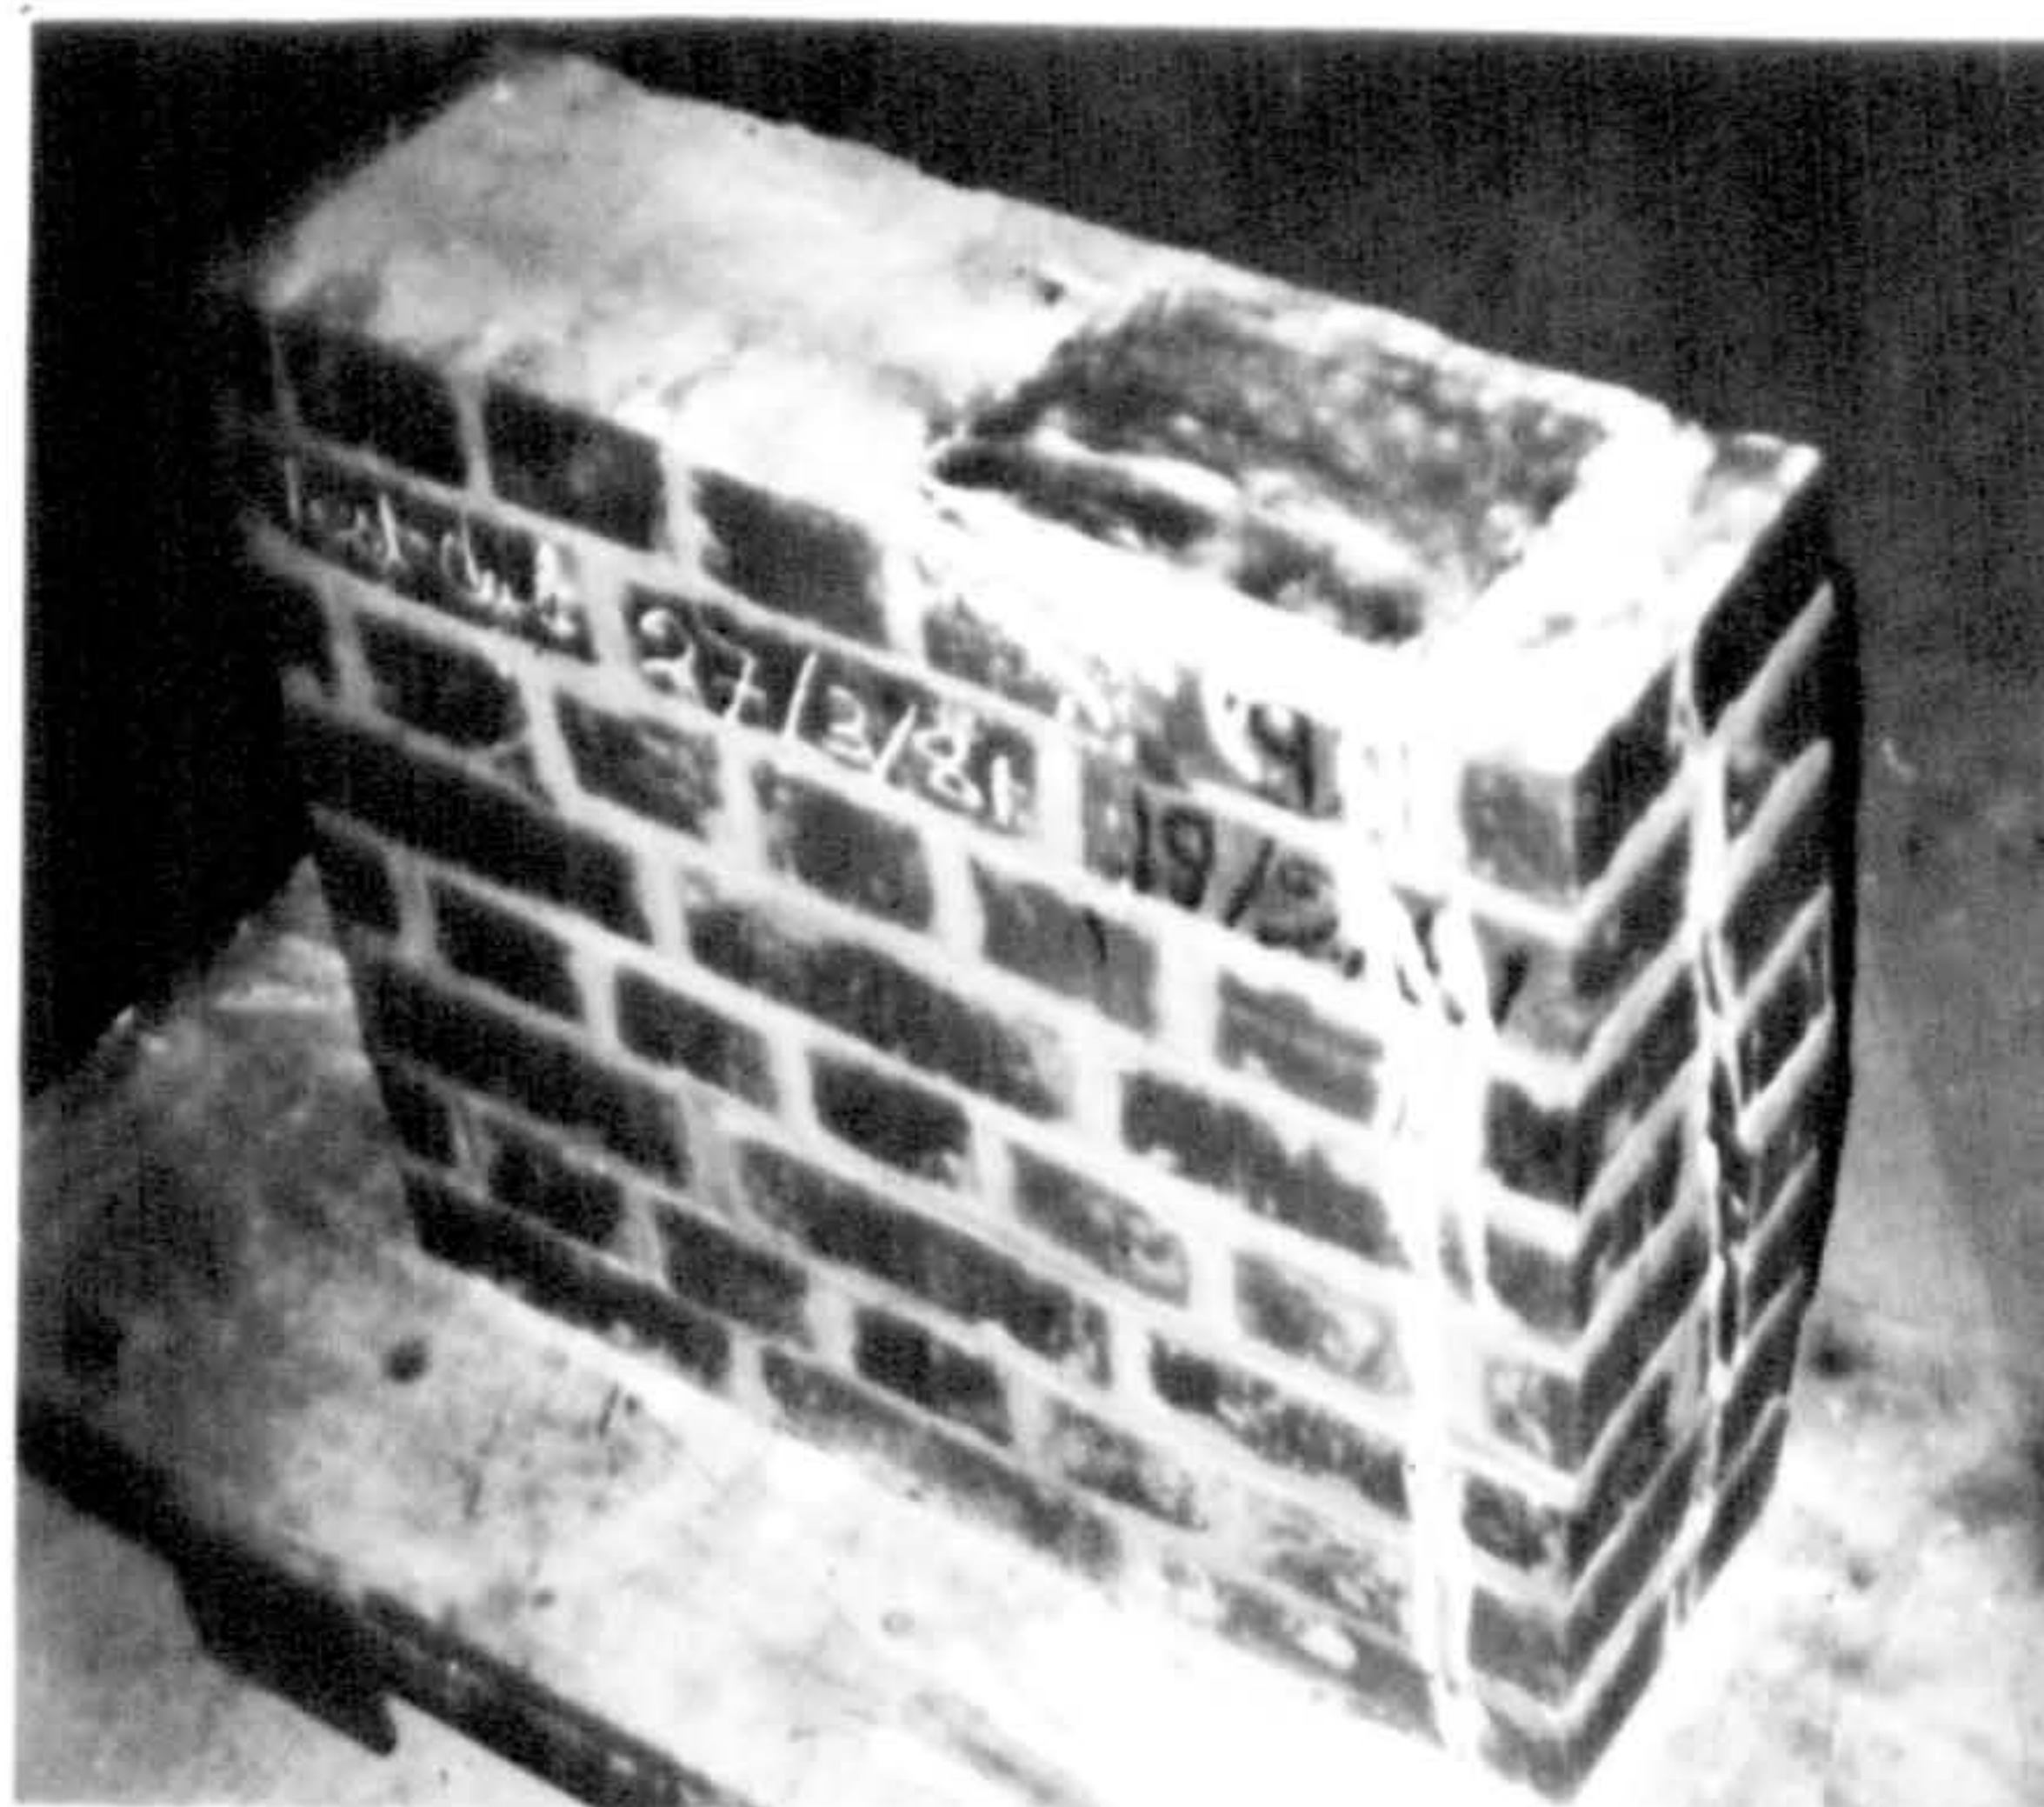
Typical failure mode and crack pattern for brickwork type M under central edge loading ( $t=215.0\text{mm}$ ).
